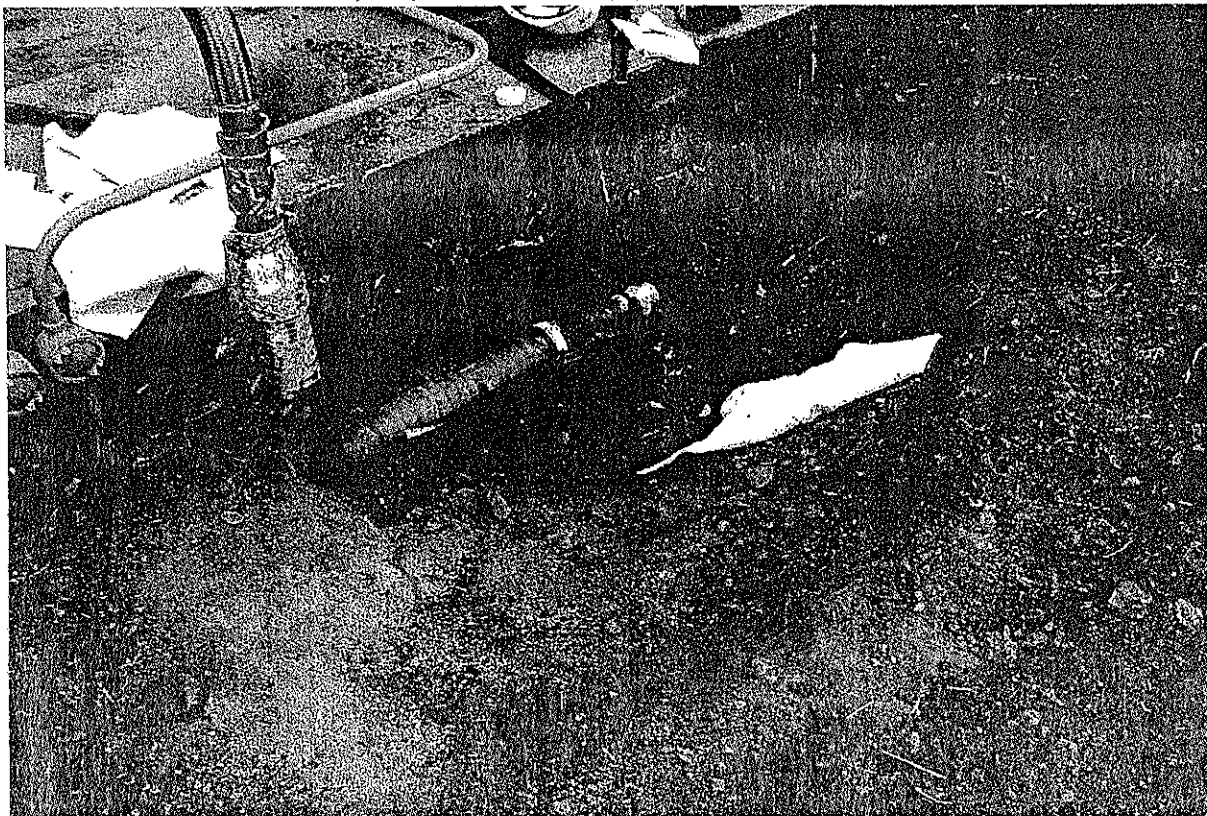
Test Pit (C-1) Located East 4,000 gallons Gasoline AGST
